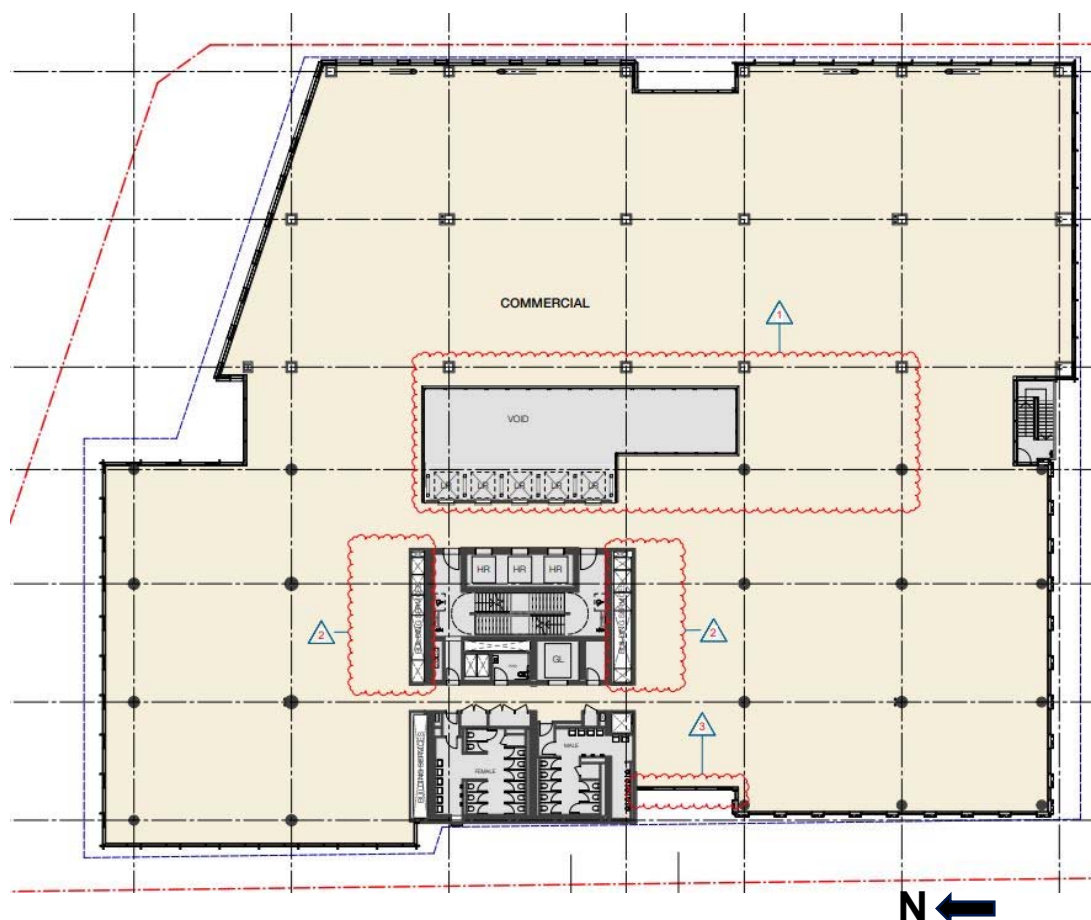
| Typical commercial floor (source: Applicant's RtS)
